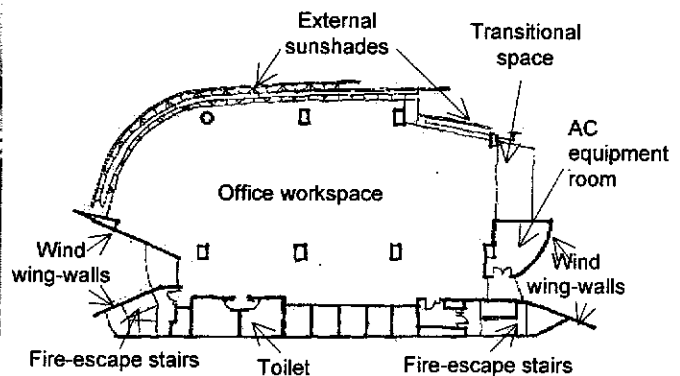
Plan of UMNO floors without W-facing transitional space
